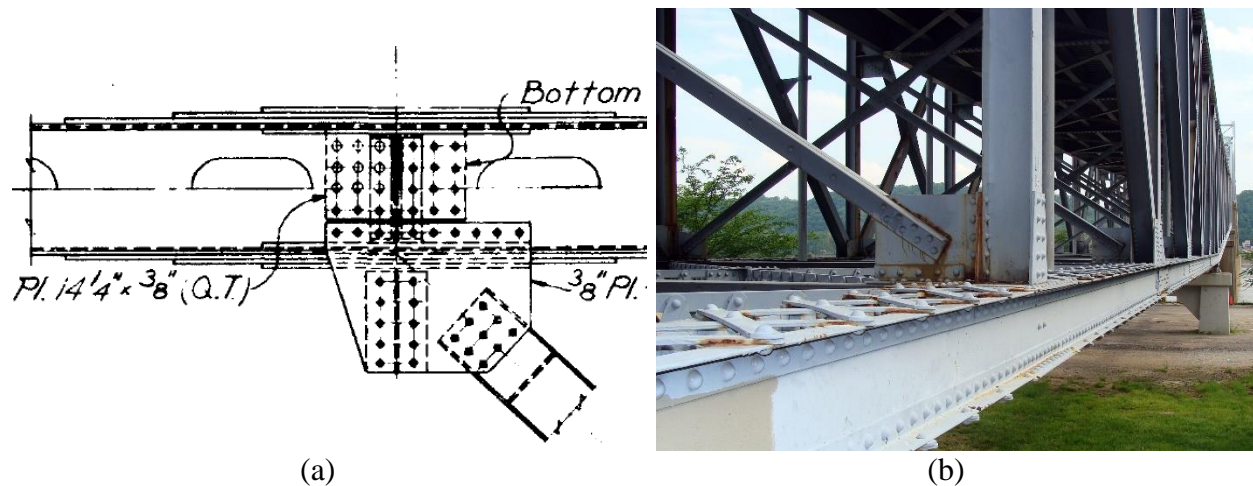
Truss member connection details: (a) A shop drawing for a typical main truss to lower brace connection in the I-35W Bridge. Sverdrup & Parcel and Associates Inc. (1965). State of Minnesota Department of Highway Construction Plan for Bridge No. 9340 – Balance of Bridge and Approaches. St. Louis, MO. Used under fair use, 2015; (b) A photo showing a typical main truss connection and a typical main truss to sway brace connection in the M-Bridge (<http://www.purdue.edu/newsroom/research/2011/110726ConnorBridge.html>)
